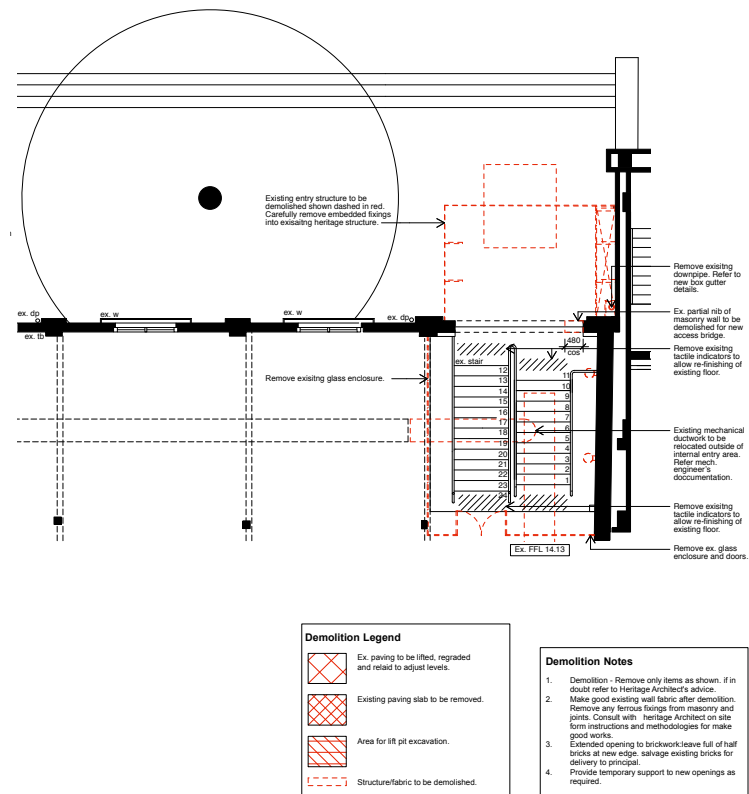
First floor demolition plan prepared by Welsh + Major Architects showing the extent of the proposed works.
